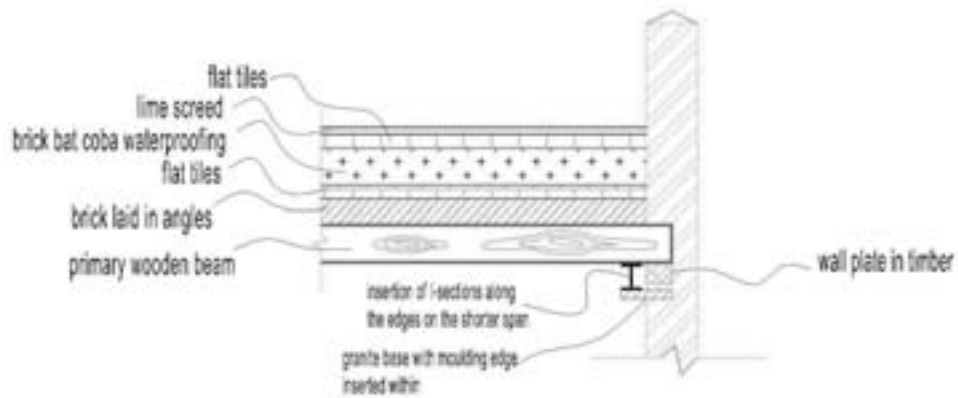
Typical section of a Madras terrace roof with insertion of I-sections along the ends to prevent sagging, and further support the primary wooden beam that has deteriorated due to water seepage and lack of renewal of the water proofing layers above
